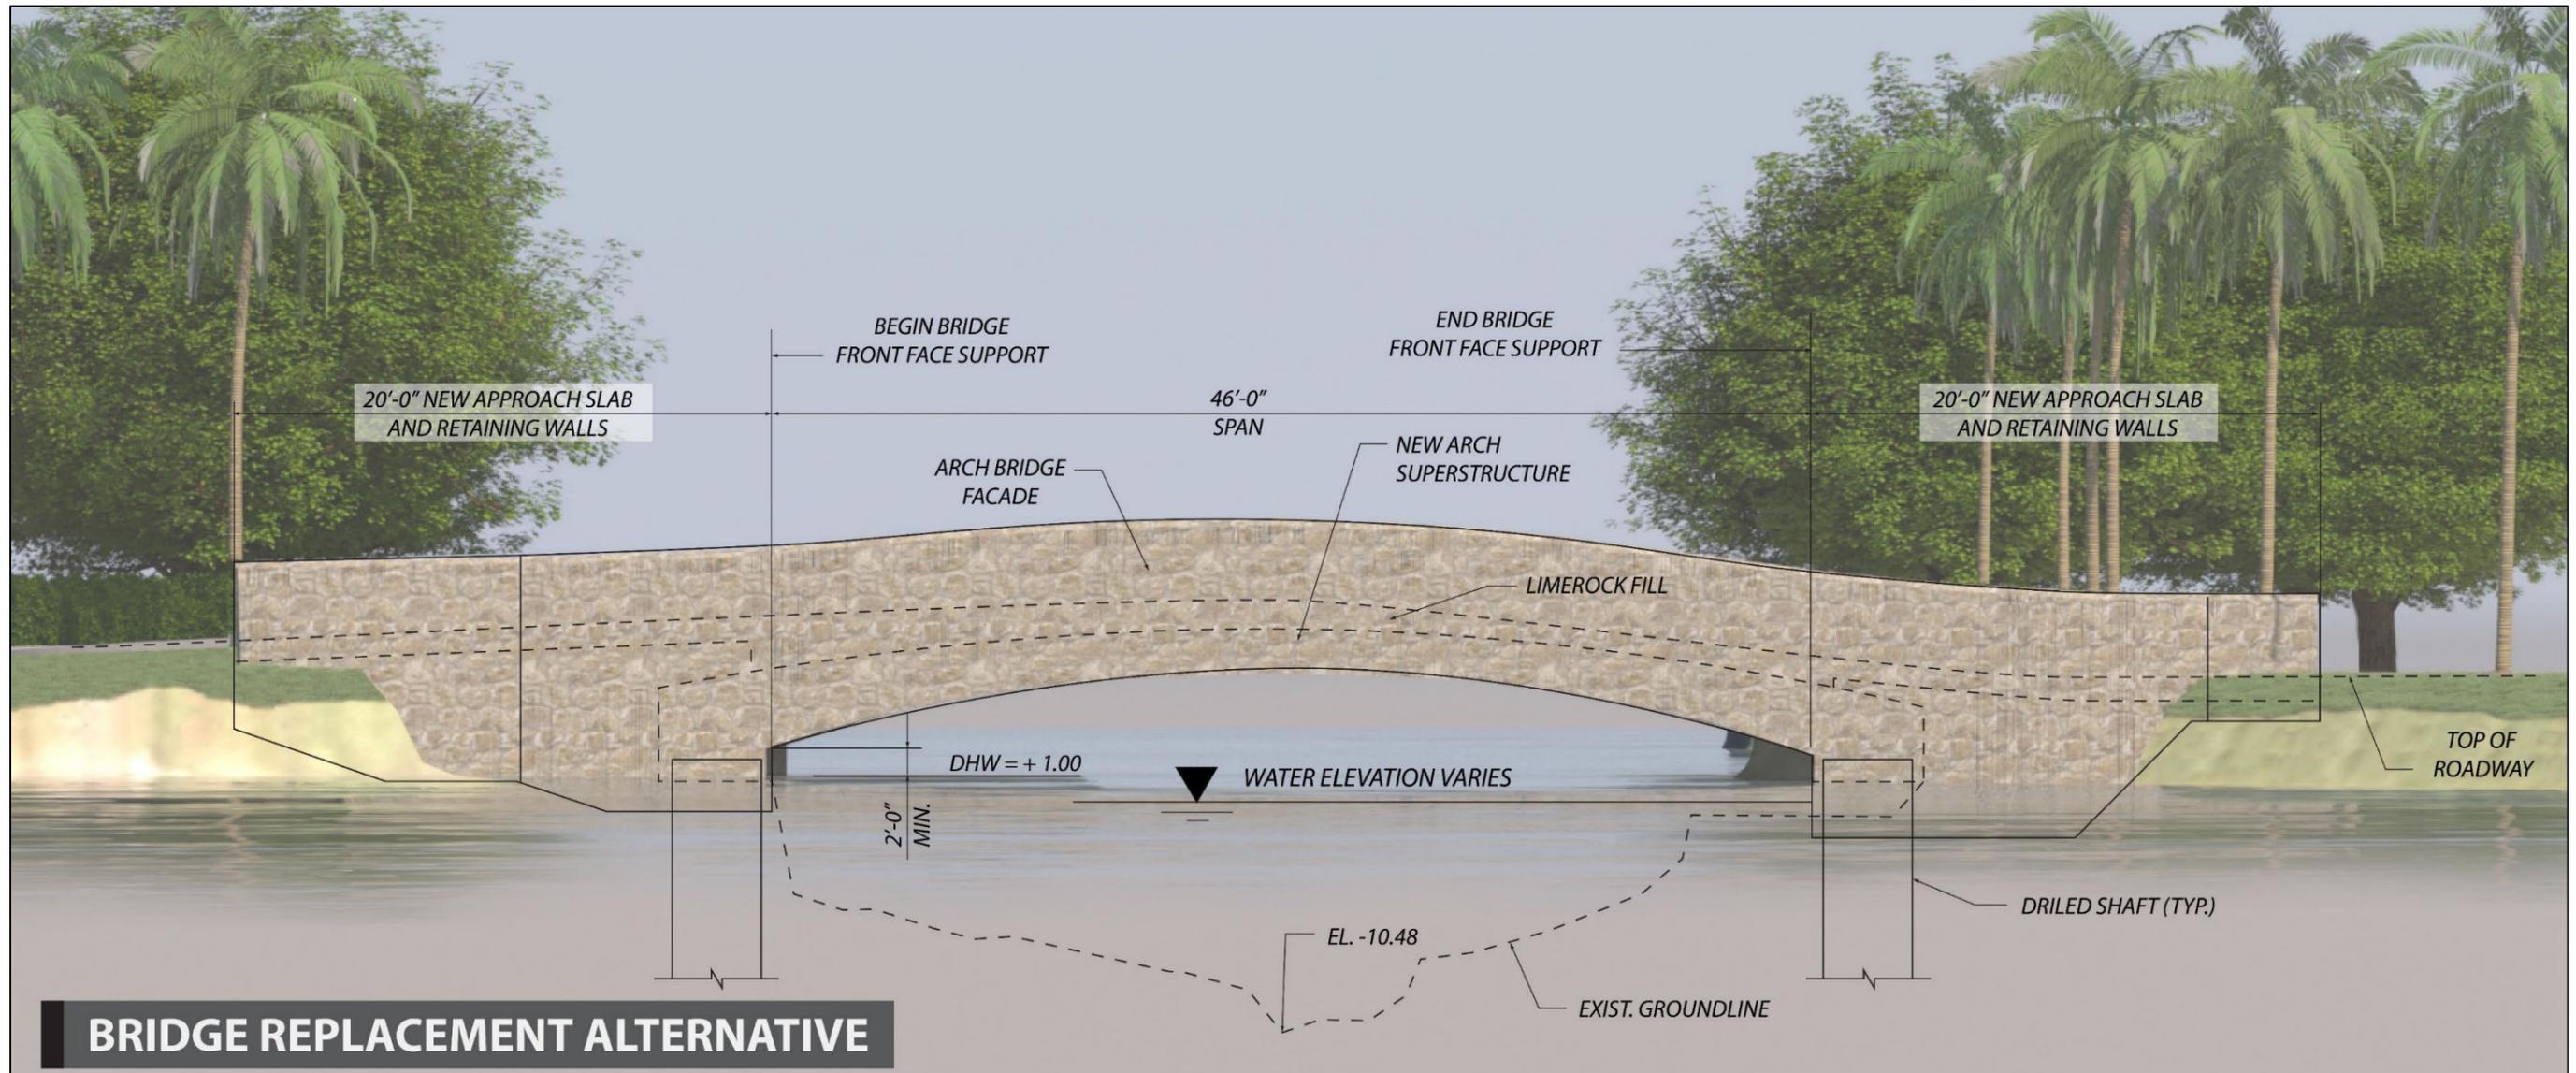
Replacement Alternative (Build Alternative #2): Elevation View
